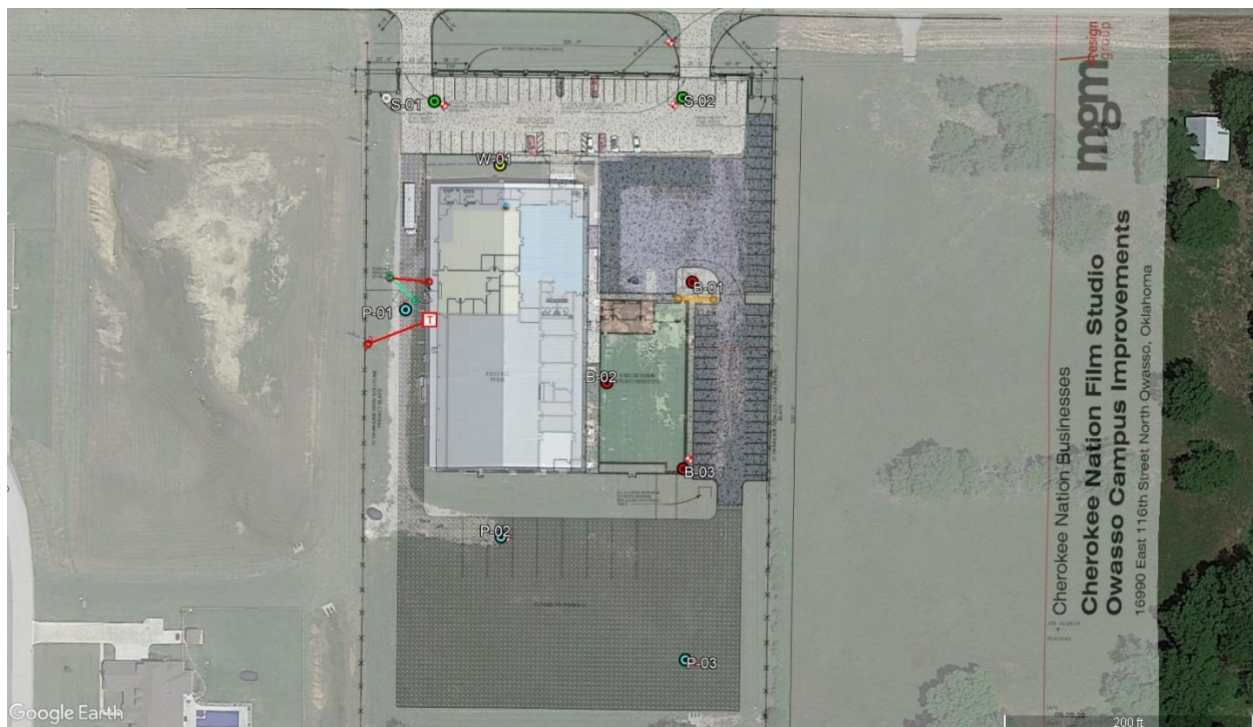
Site overview with planned building addition area outlined (Google Earth, June 2022)
